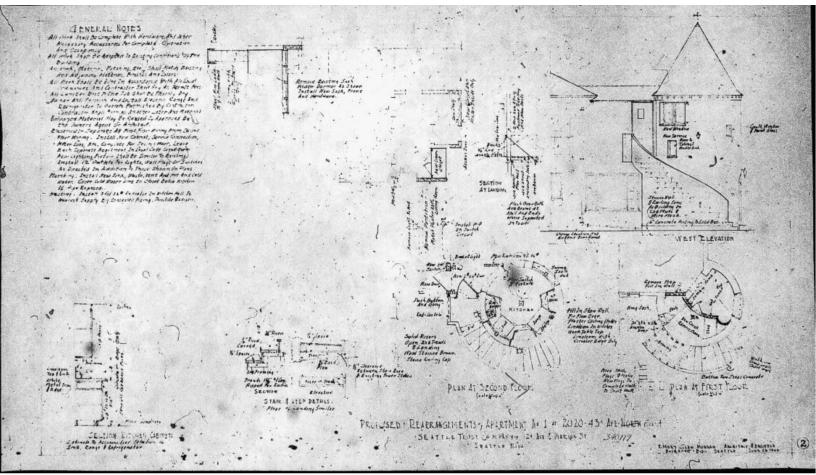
"Proposed Rearrangements of Apartment No 1 at 2020 43rd Ave North East ... [Building Permit] 340117
